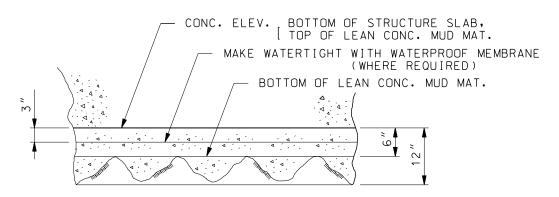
Typical Detail for Installation of Waterproofing Membrane
